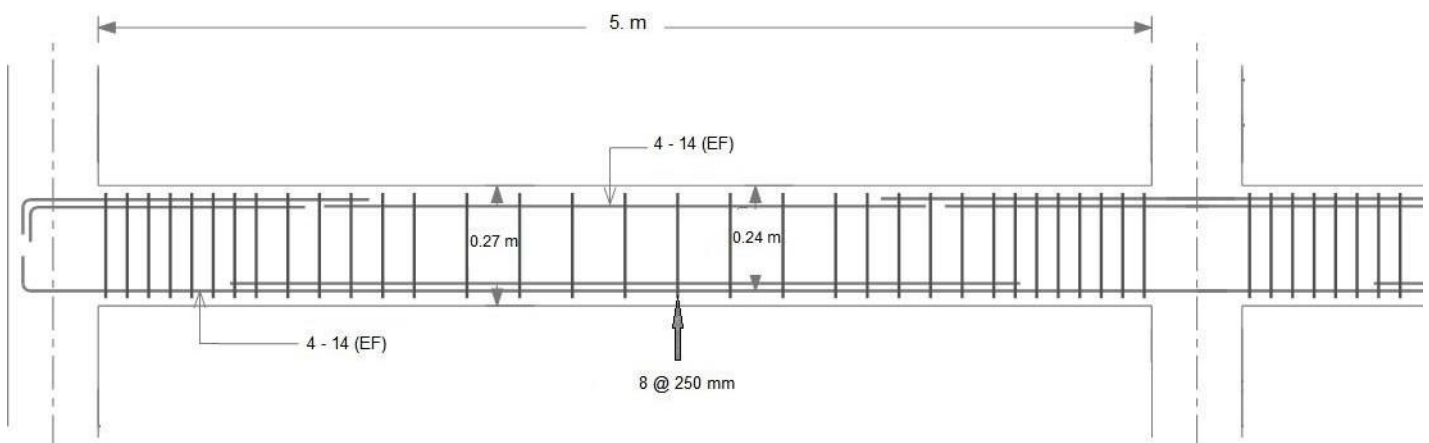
Reinforcement Detailing for Hidden Beam (Ribbed slab)
